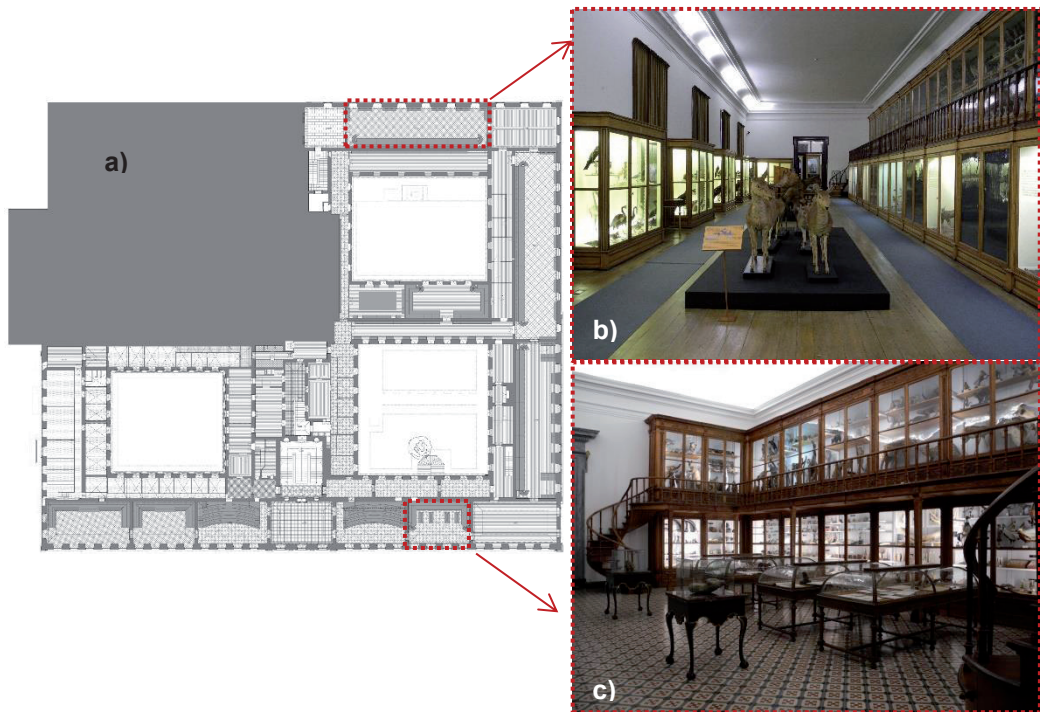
a) Plan of the first floor of MCUC; b) Portugal Hall; c) Vandelli Hall
